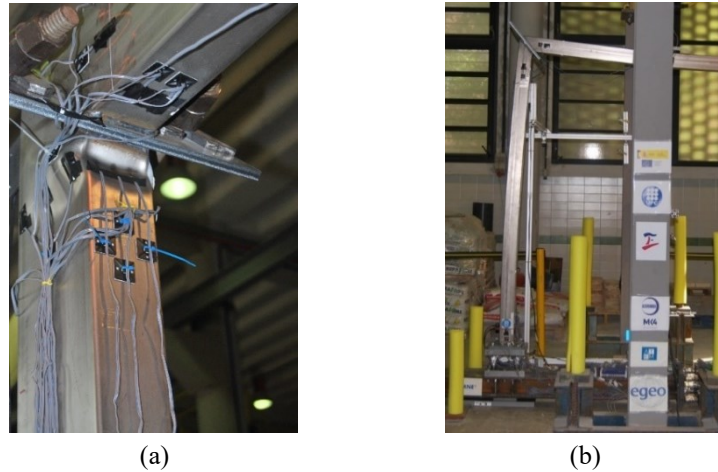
Details of: (a) the local buckling failure in Frame 4 and (b) the deformed left column in Frame 1.
